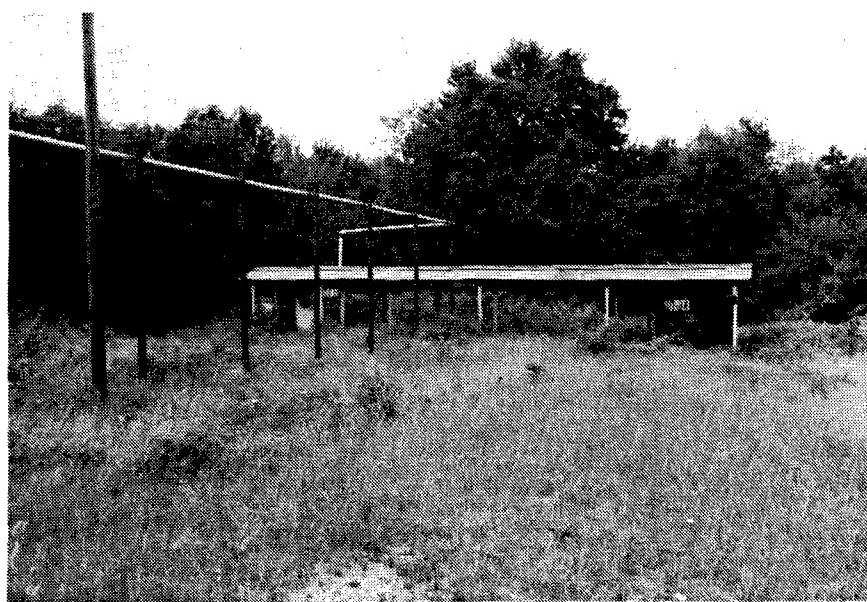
Building DT-35 and Building DT-34: Metal Parts Loading Buildings.
